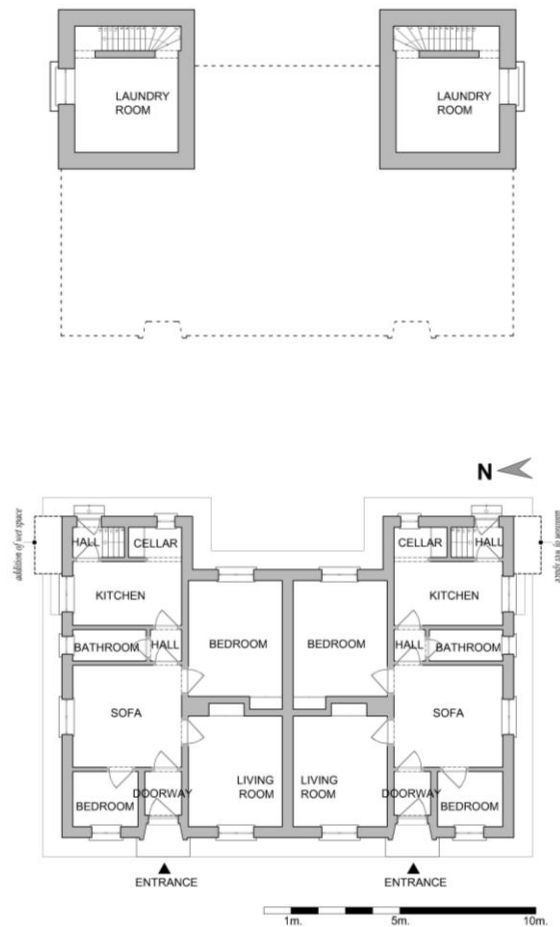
Basement and ground floor plans of Employee Dwelling Type 9
